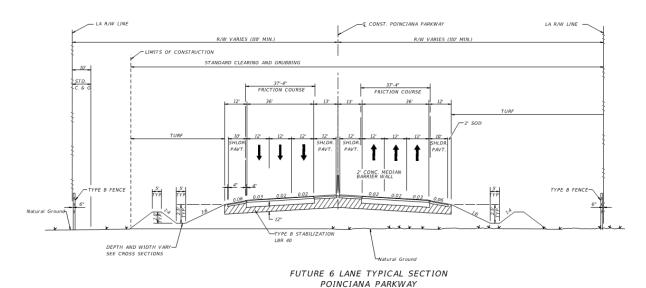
FUTURE 6-LANE TYPICAL SECTION - POINCIANA PARKWAY SEG. 3
